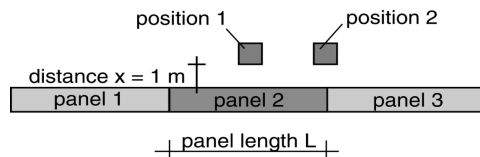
Schematic plan view of the diaphragm wall section and considered positions of the adjacent single footing.
